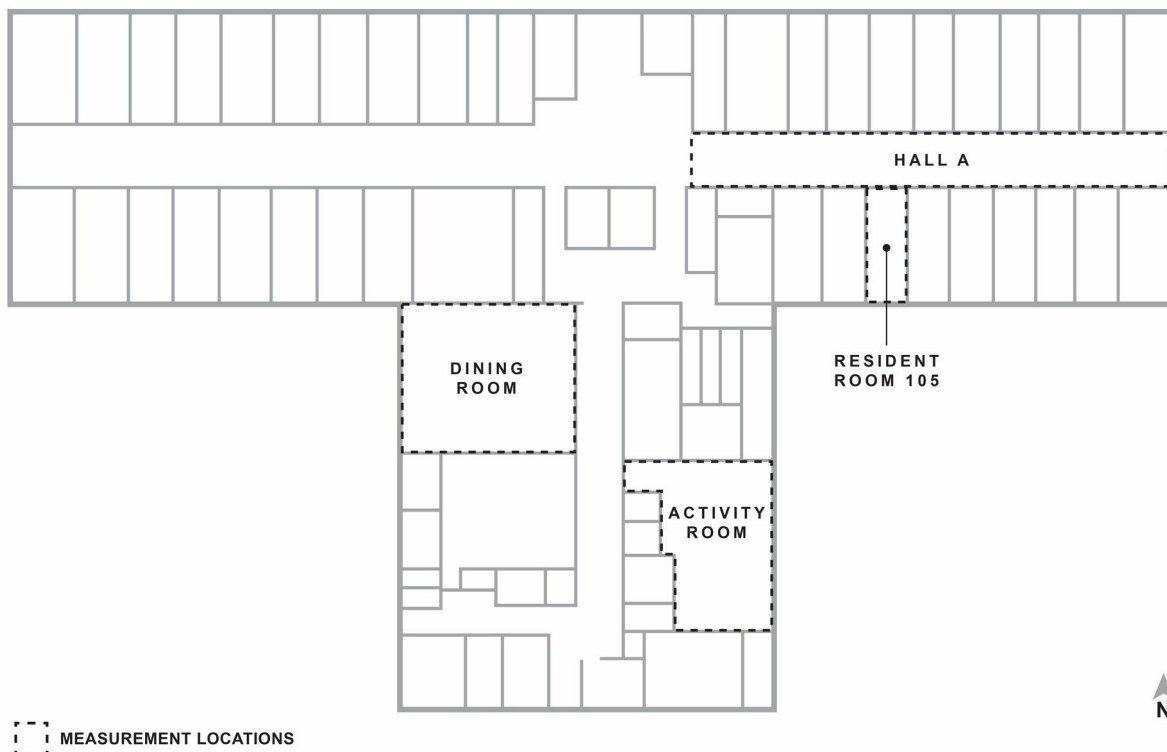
Montello Care Center schematic floor plan. Lighting measurements were taken in the rooms shown with a dashed outline. This plan is not to scale.
